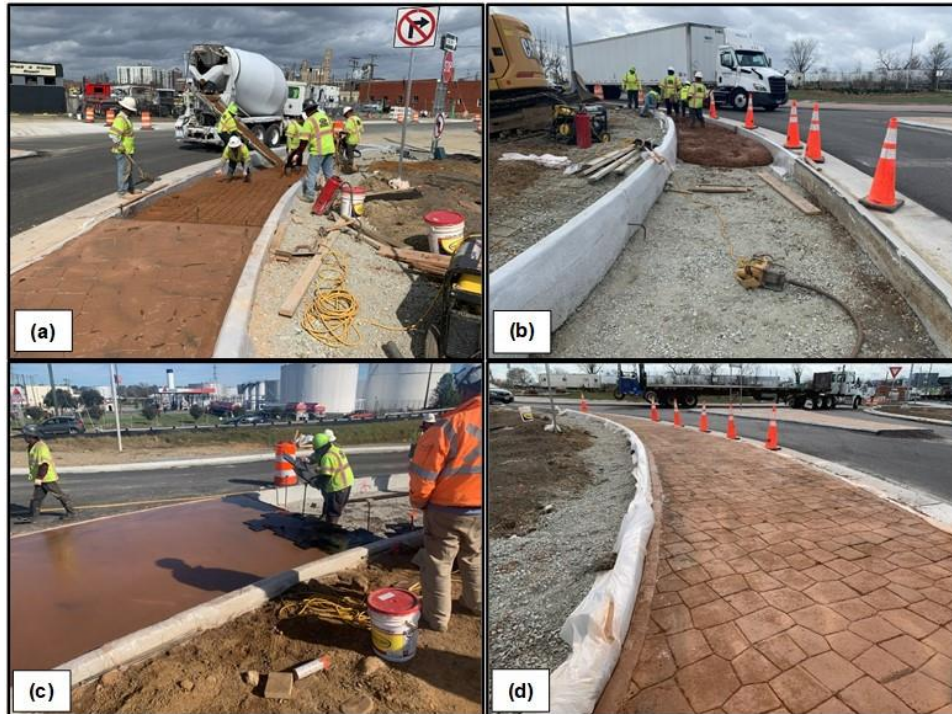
Maury Street Roundabout Construction: (a) Concrete Delivery and Wire Mesh Reinforcement; (b) Slab Tied to the Curb with a J-Bar and Construction under Live Traffic; (c) Concrete Stamping; (d) Final Stamped Surface (Courtesy of VDOT's Richmond District)
